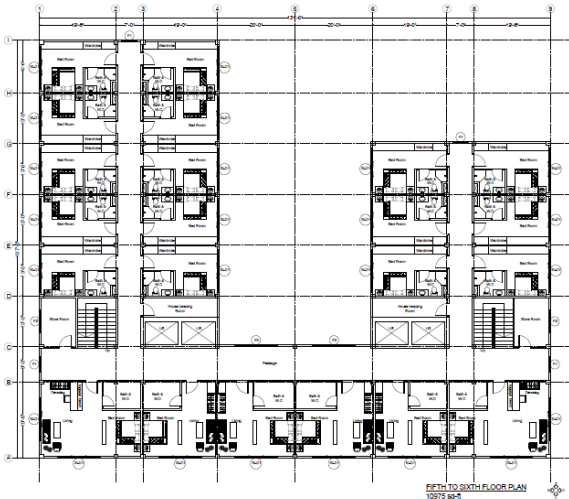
Architectural View for 5<sup>st</sup> to 6<sup>th</sup> Floor Plan
